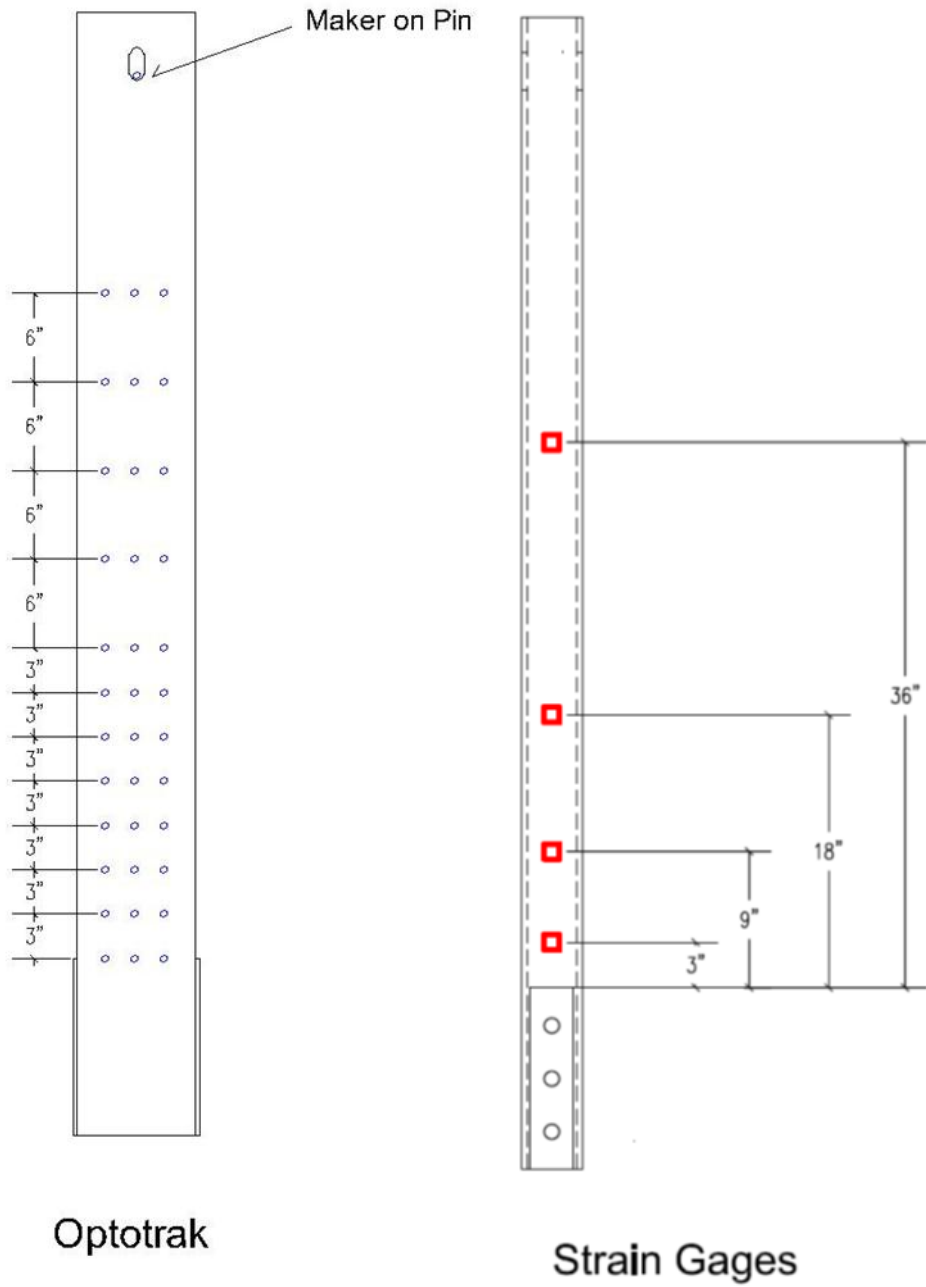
Typical Optotrak marker and strain gage locations on HSS beam specimen
